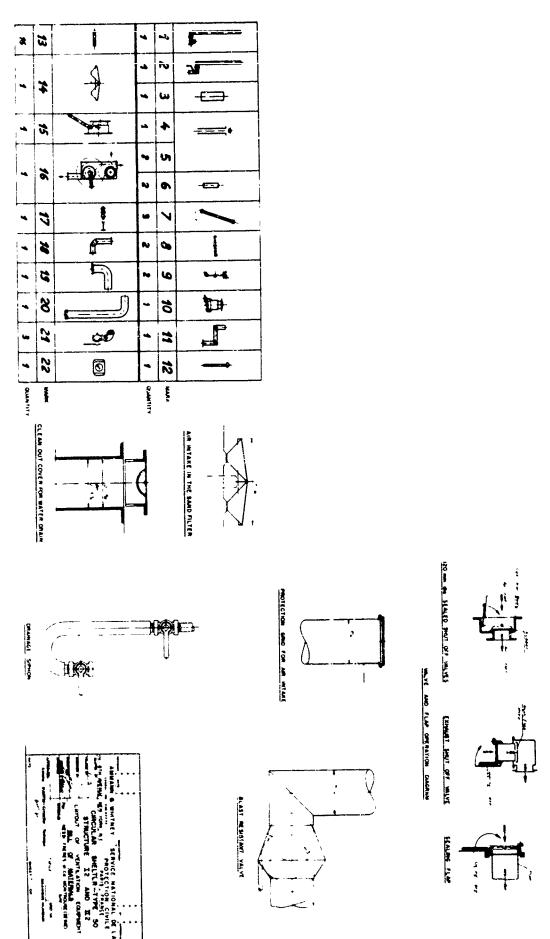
Circular shelter, type 50, structure II-2, instrumentation layout.
